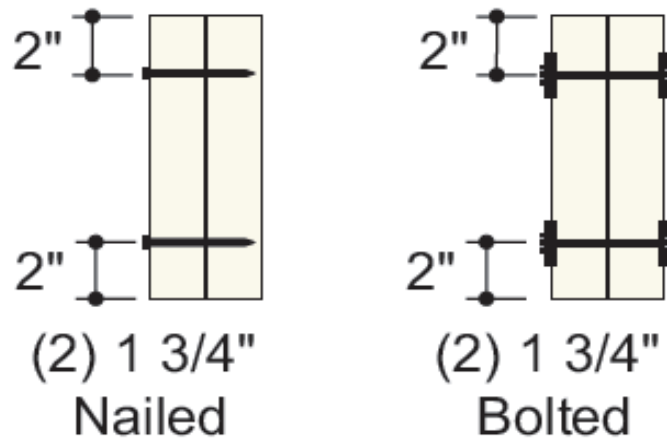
ASSEMBLY A (2-PLY BEAM)
